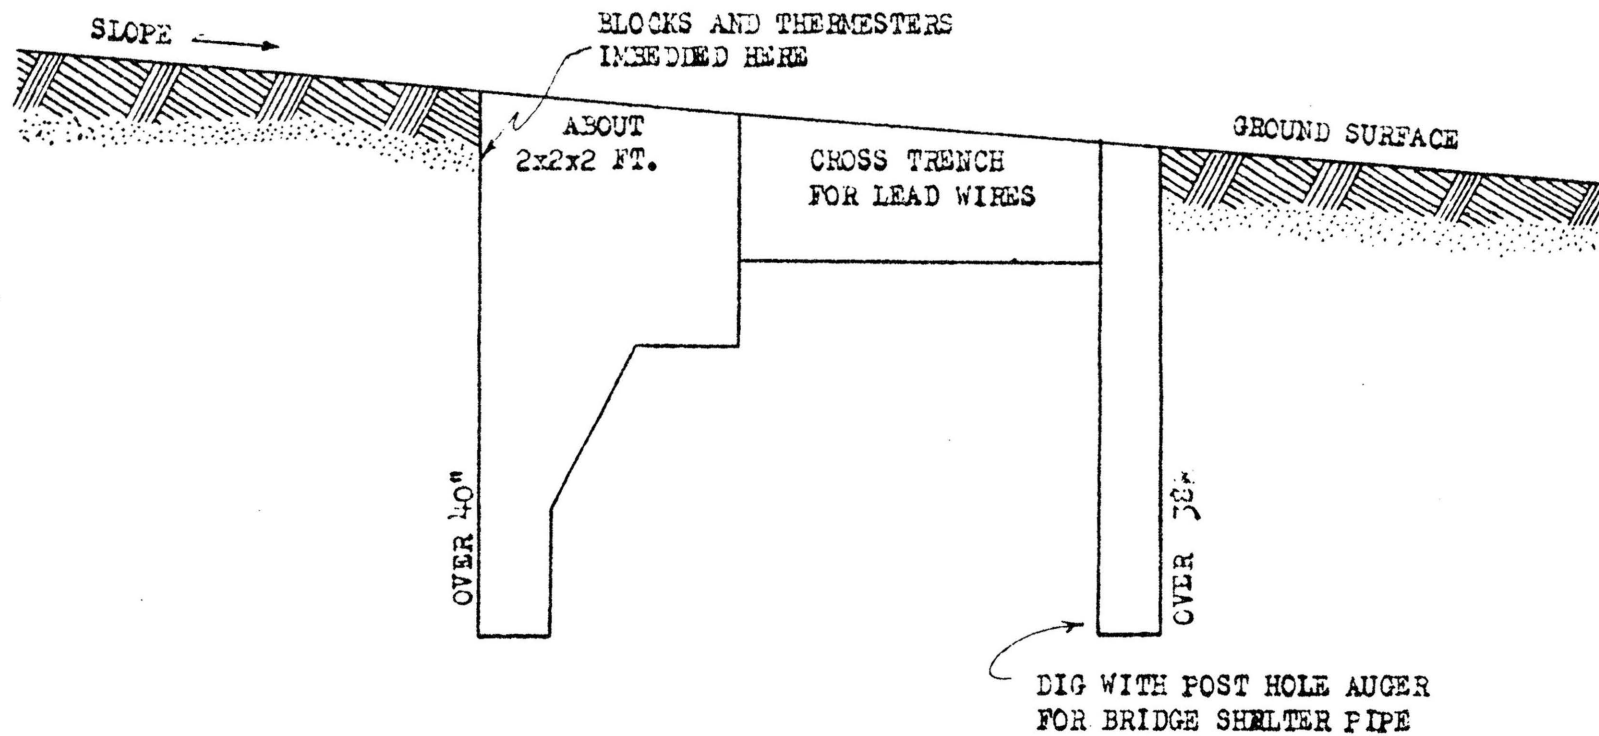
CROSS SECTION OF EXCAVATION FOR INSTALLATION
